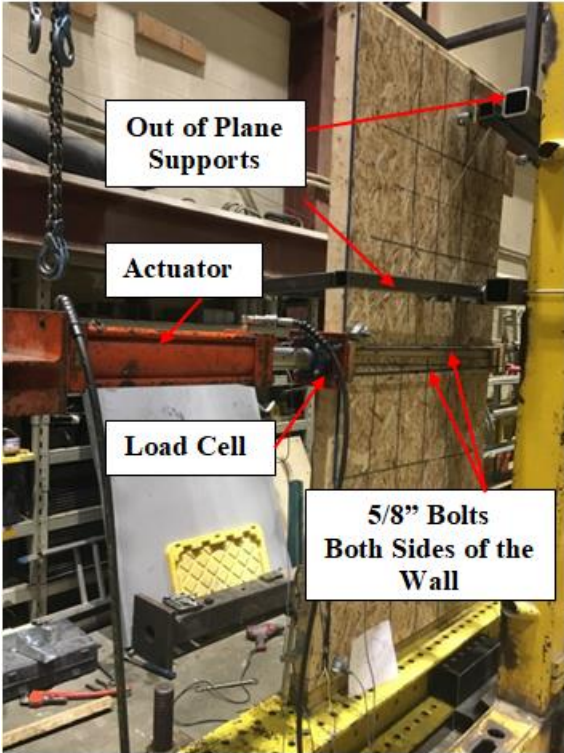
Double Storey Half-Scale Shear Wall Test Setup (Pushing Bottom Wall)
